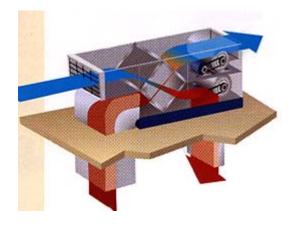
Example rooftop heat recovery unit for outdoor air handling.
